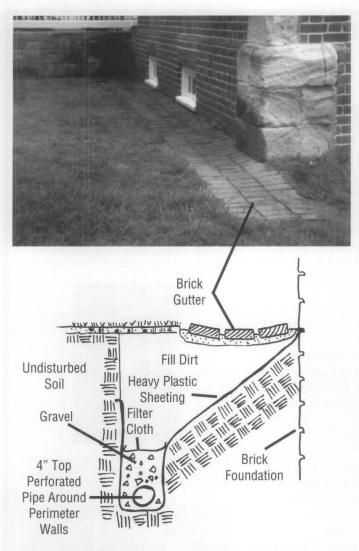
This detail drawing shows a sub-surface perimeter drain in conjunction with a historic brick ground gutter system to help control roof run-off moisture from entering the historic foundation. Detail: Courtesy, Gunston Hall Plantation. Photo: Elizabeth Sasser.
